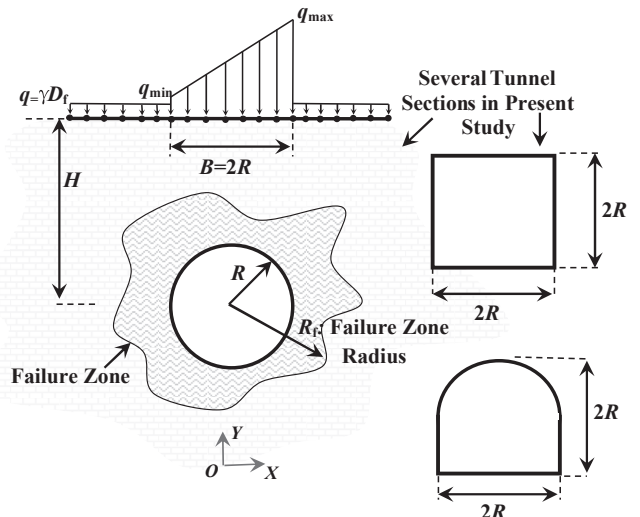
Tunnel cross-sections for studying failure radius.
